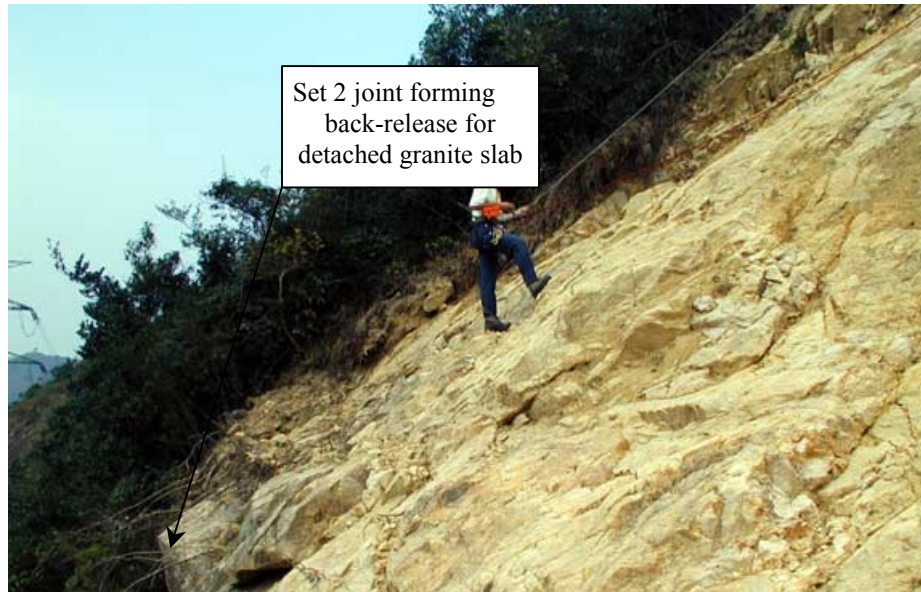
View of the Floor and Lower Right Flank of the Source Area
